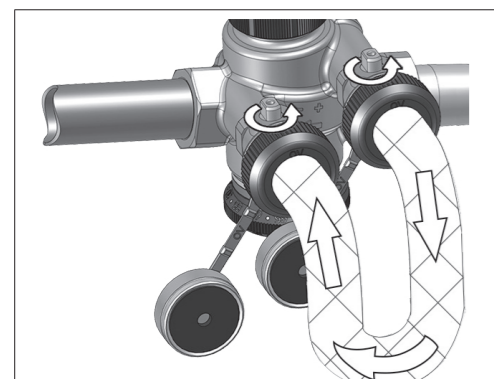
Draining, filling, flushing and bleeding of a complete section of the system
